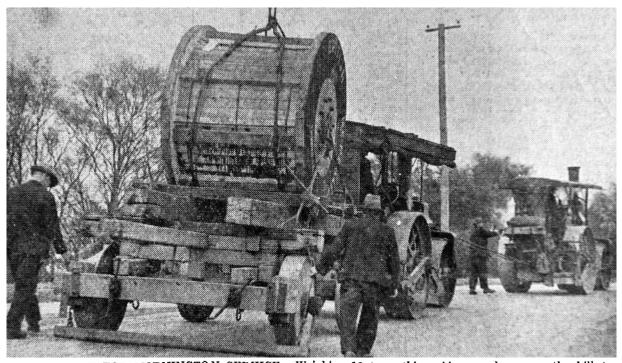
Timber inserts forming parts of the reefer or idle wheel used in the Mornington winding gear. The wheel of the 1948 news item above? DCC. Archives. Transport Department Series List. M-89. Section of Rope and Reefer Wheel for Mornington Tramway Drive.
